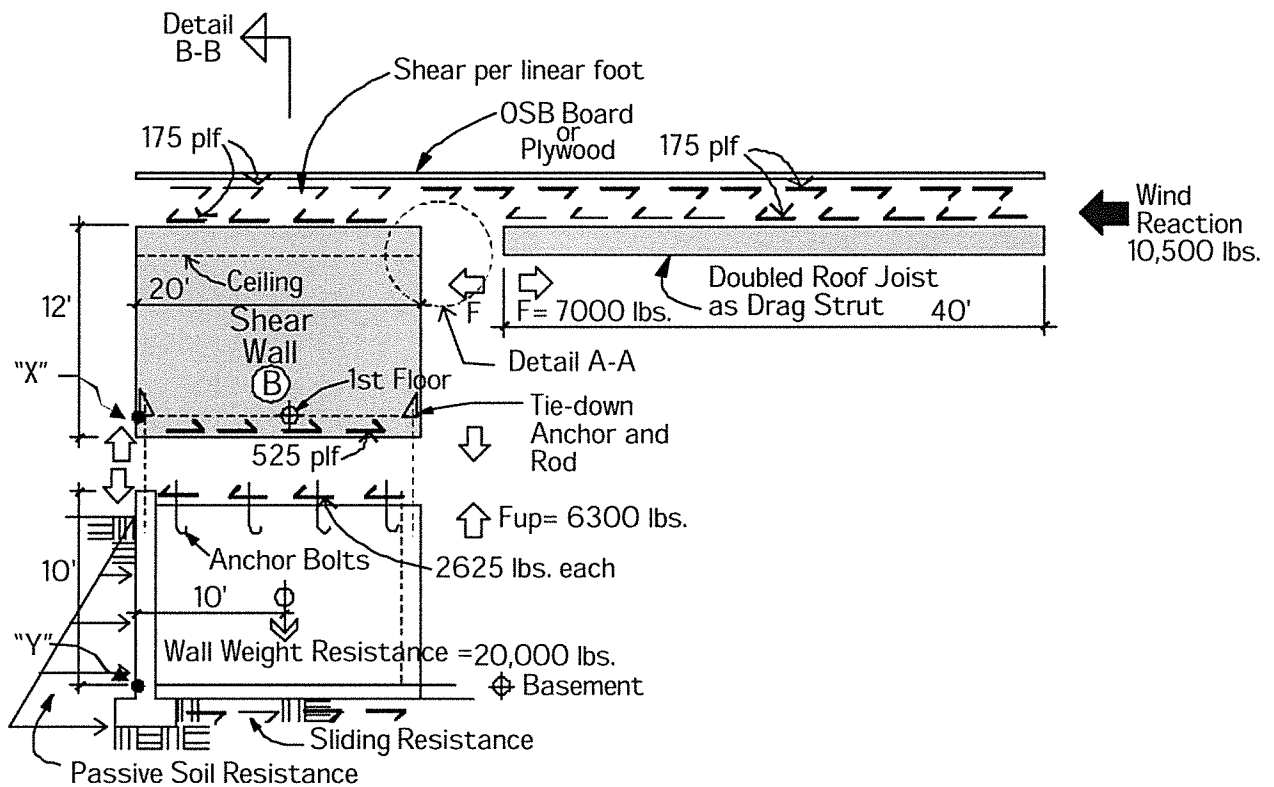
Drag Strut Force Distribution To Shear Wall and Foundation
